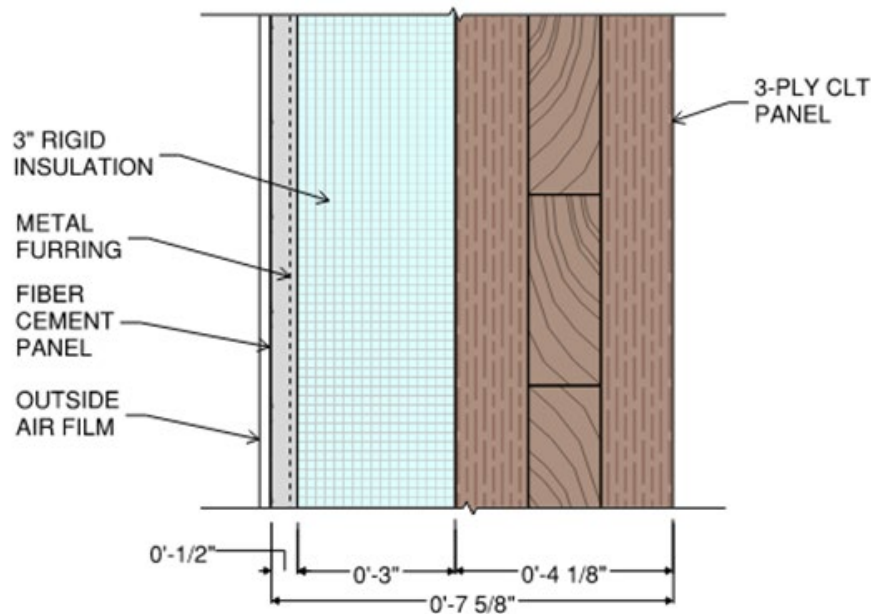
Non-structural cross-laminated timber wall assembly section detail
